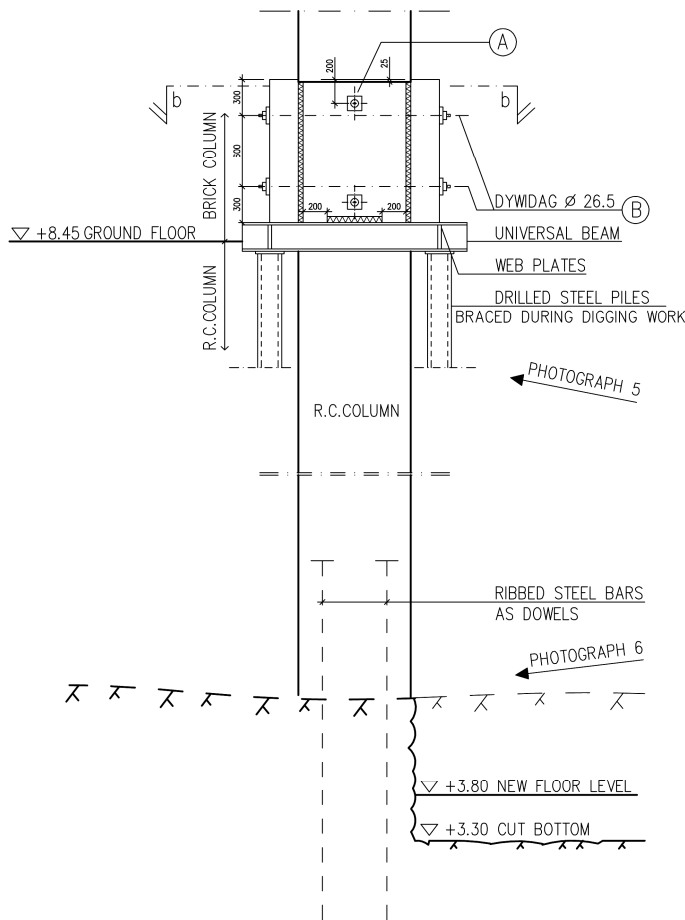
Eastern stair column, Pretensioned concrete mantel, Vertical steel dowels
